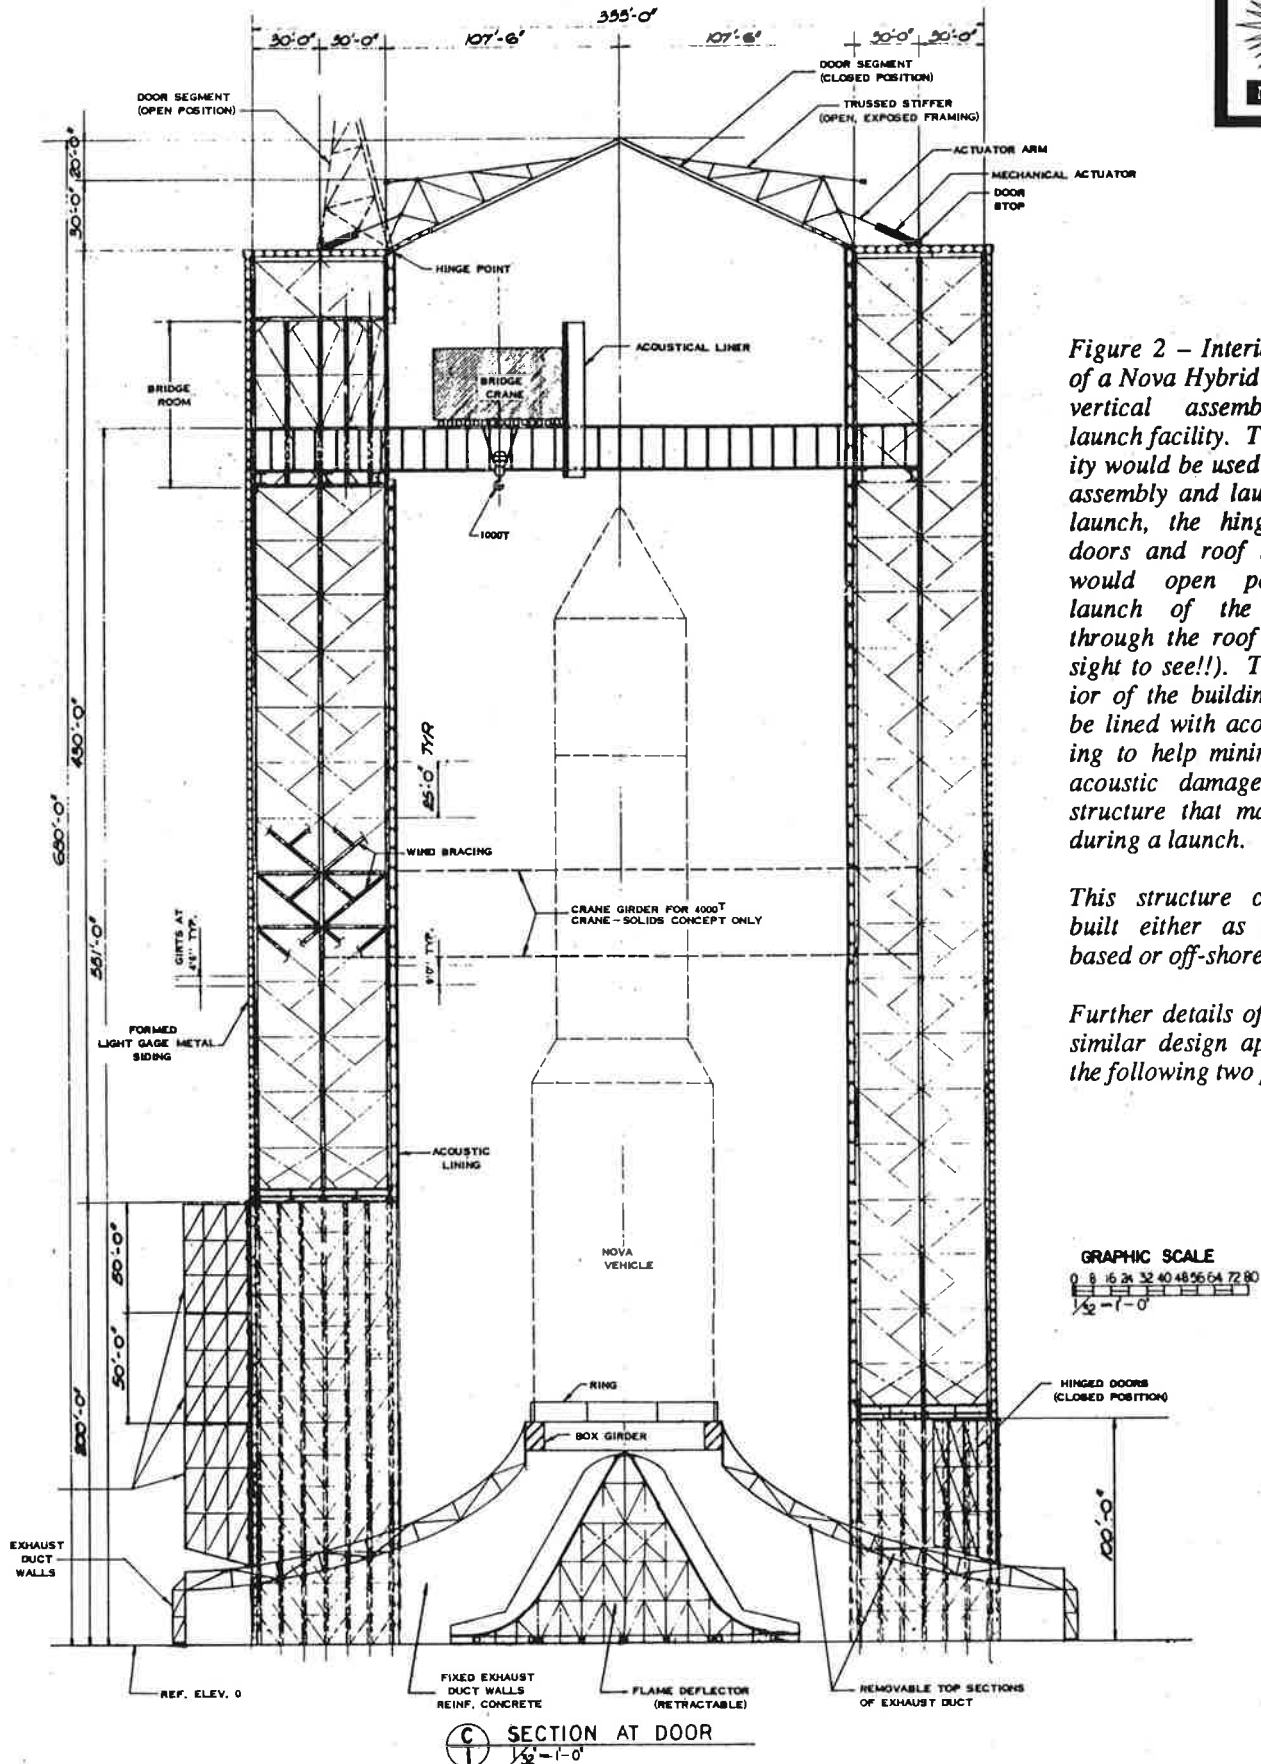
Interior detail of a Nova Hybrid Concept vertical assembly and launch facility. This facility would be used for final assembly and launch. At launch, the hinged vent doors and roof structure would open permitting launch of the vehicle through the roof (what a sight to see!!). The interior of the building would be lined with acoustic tiling to help minimize any acoustic damage to the structure that may occur during a launch.
